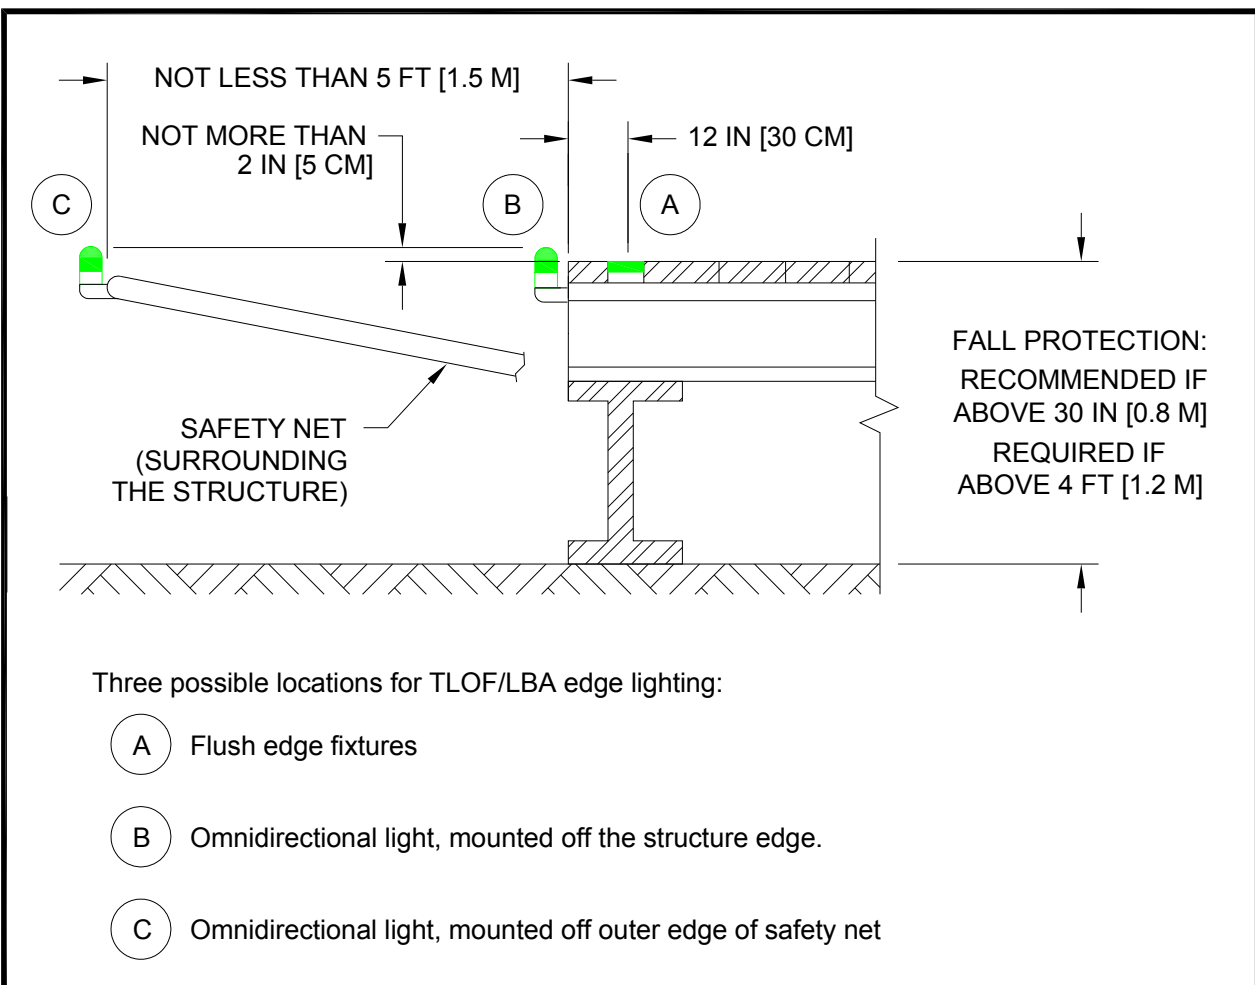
Elevated TLOF – Perimeter Lighting: General Aviation
